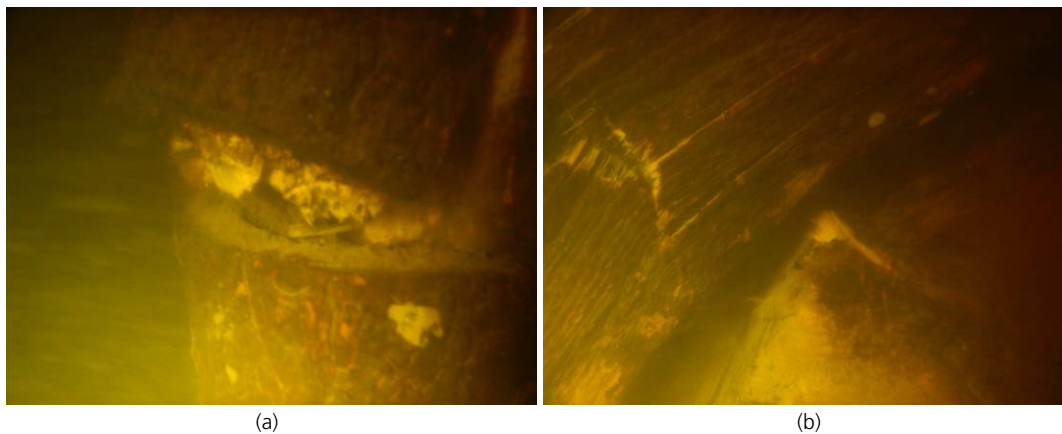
Pictures of the collapsed foundation under water by Van Gellecum (2021): (a) broken pile; (b) broken cross-beam
